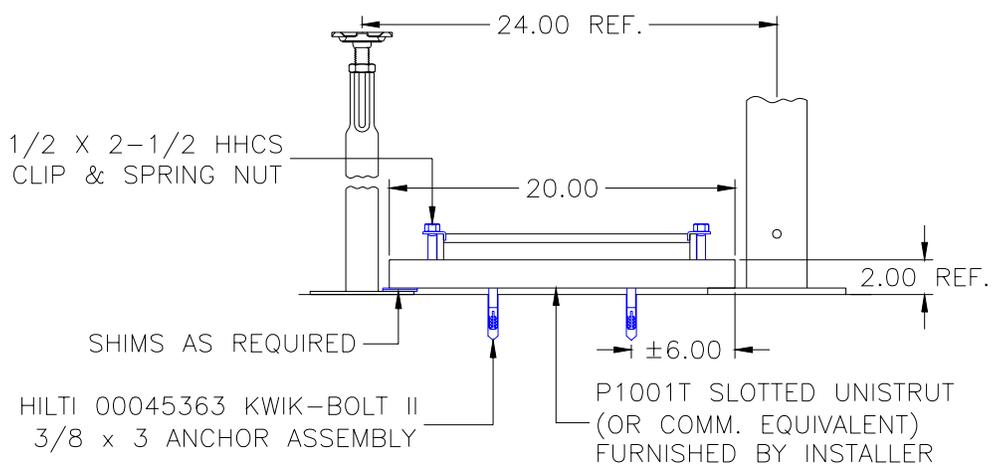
C – Bridging Low Profile Apparatus On Floor
